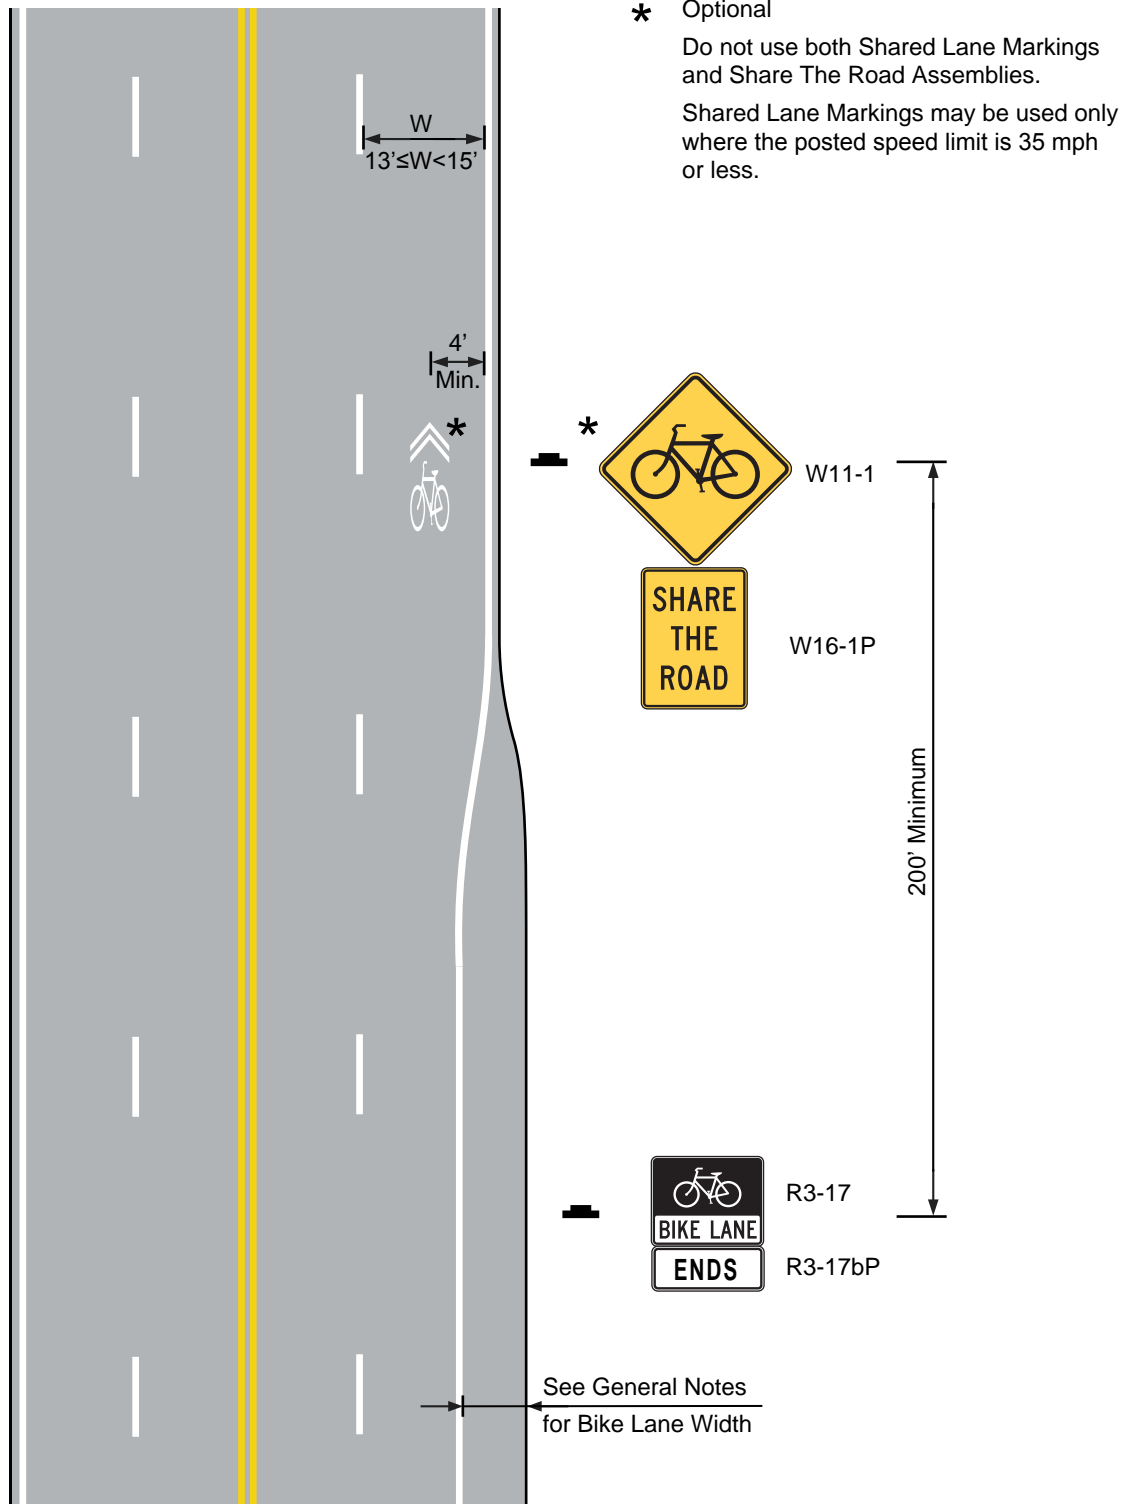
Example of Typical Transition from BIKE LANE without Parking to Shared Lane with Parking
